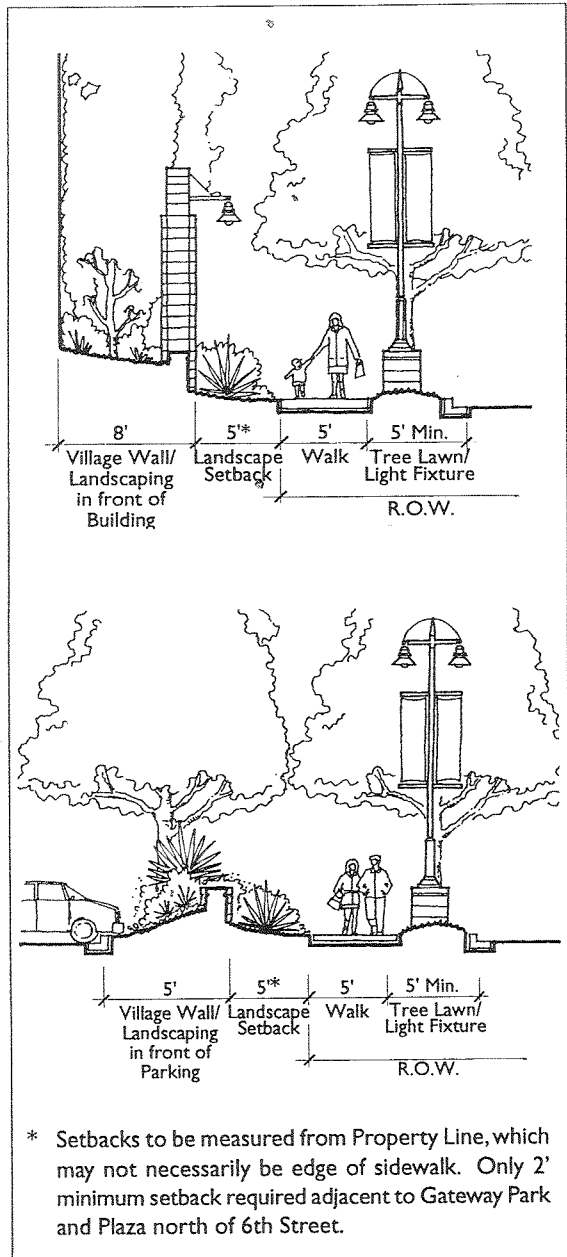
, Village Wall Setback. A landscaped setback will accompany the Village Wall. The Village Wall shall be setback at least 5 feet from street-facing property lines, except along the north edge of 6th street, where the Wall may be within 2 feet of the property line. Where the Wall abuts parking, a planting strip shall be placed behind the Wall and measure at least 5 feet from the front face of the Wall. Where the Wall becomes a trellis, a raised planter box shall be placed behind the Wall and measure at least 8 feet from the front face of the Wall.
